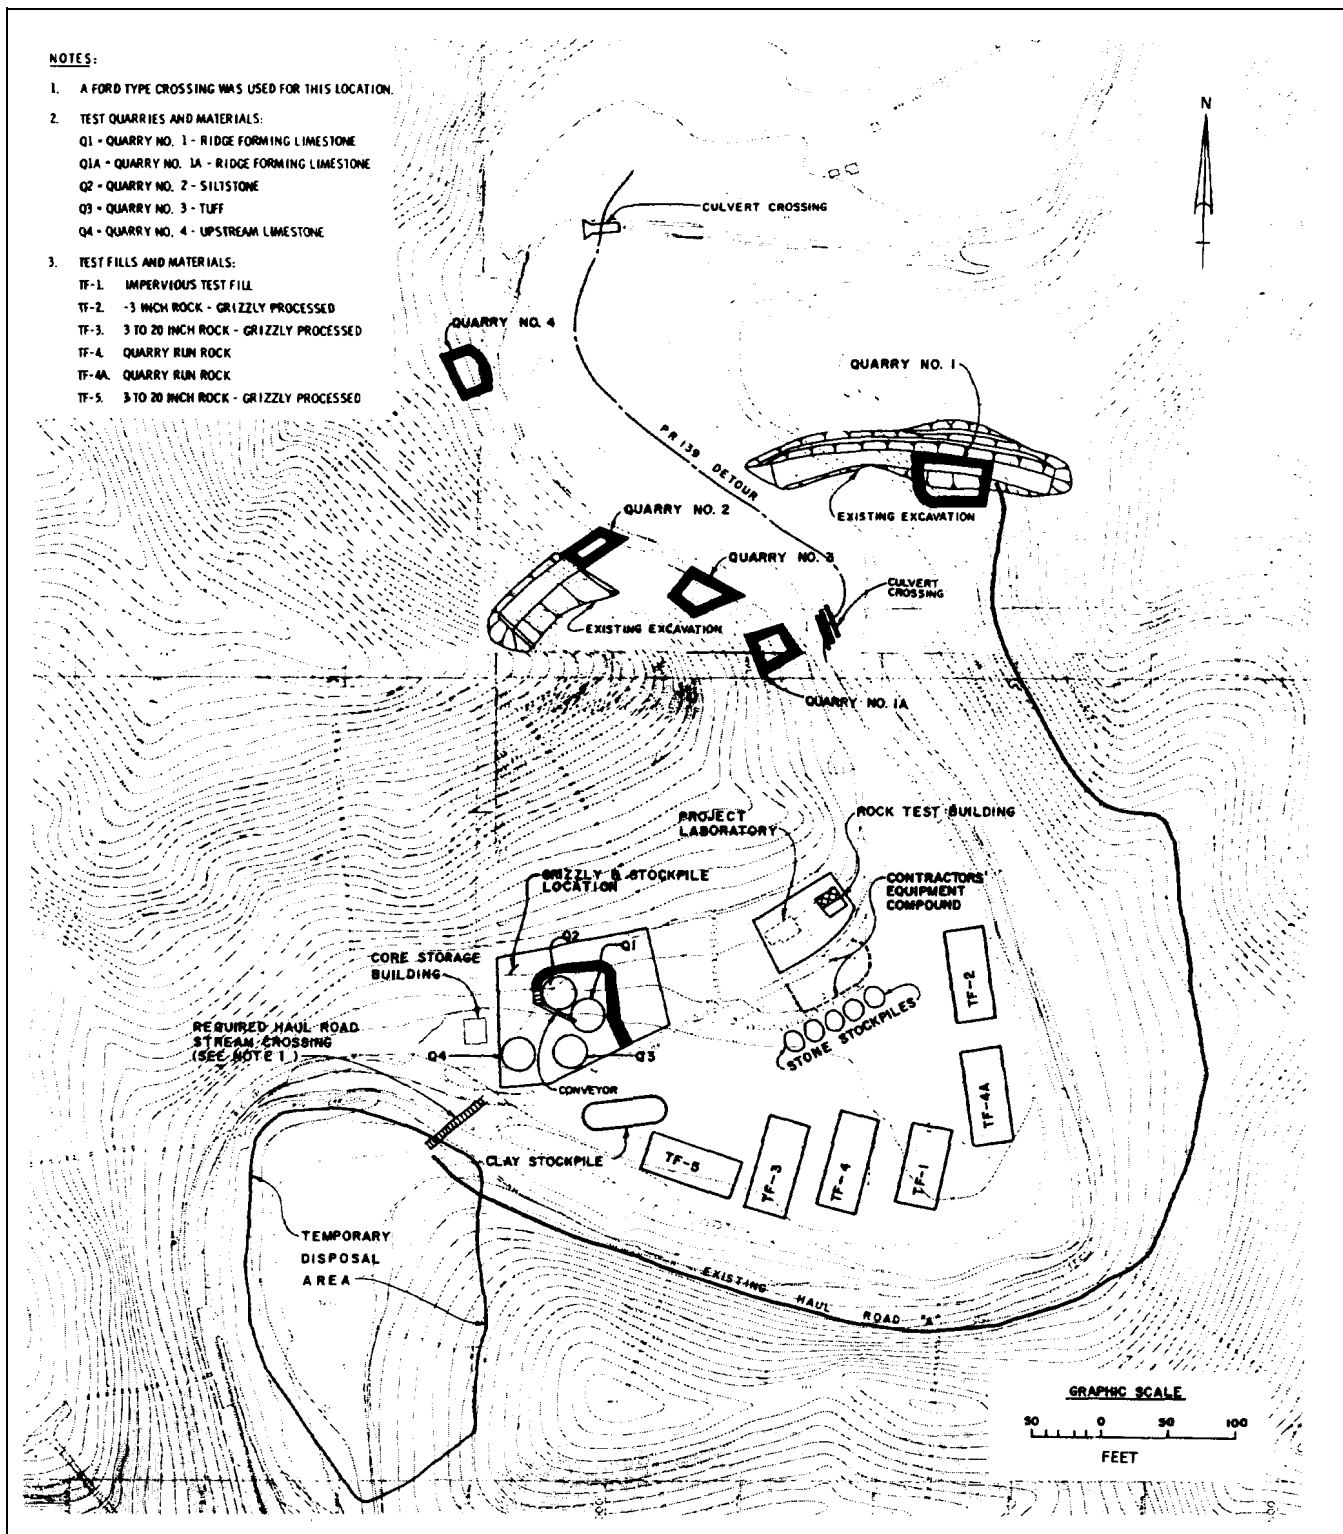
Example of a multiple test quarry layout where samples from several different rock strata are required for testing (after U.S. Army Engineer District, Jacksonville 1983)
